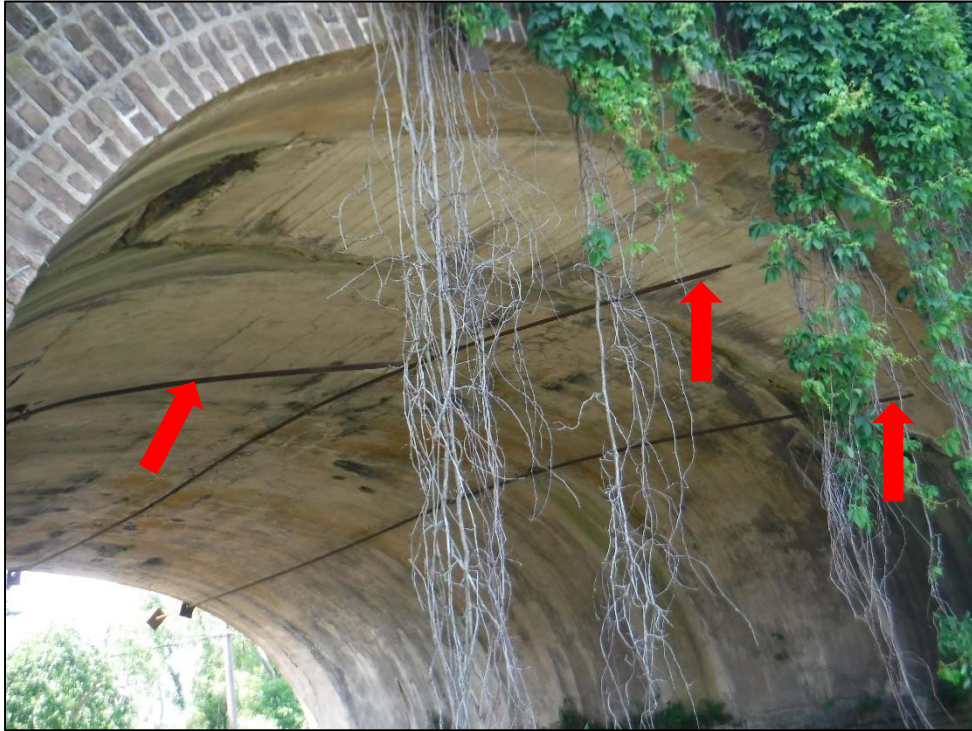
Crack with Spalled Mortar in Arch 1
